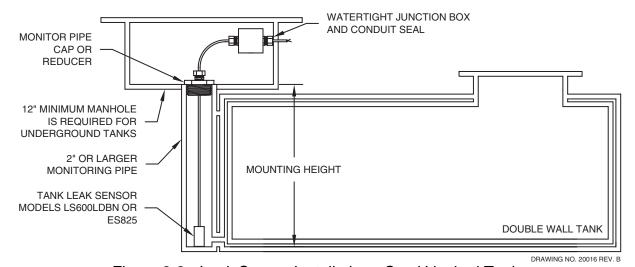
Leak Sensor Installation - Steel Vaulted Tanks
